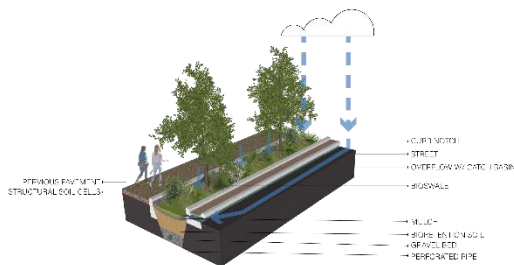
Site rendering of a potential Stormwater tree pit standard to be used throughout campus.
